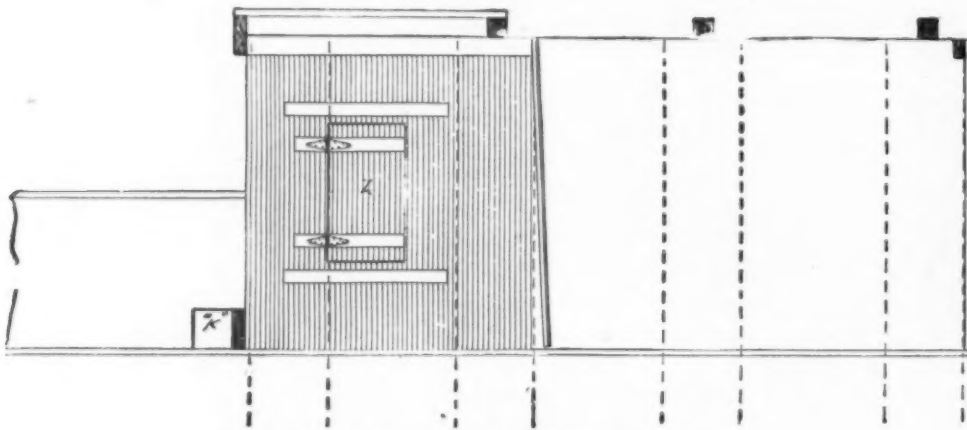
SECTION ON LINE A-A OF FIG. 24.
